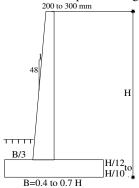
A schematic view of Reinforced Concrete Cantilever (RCC) retaining walls
